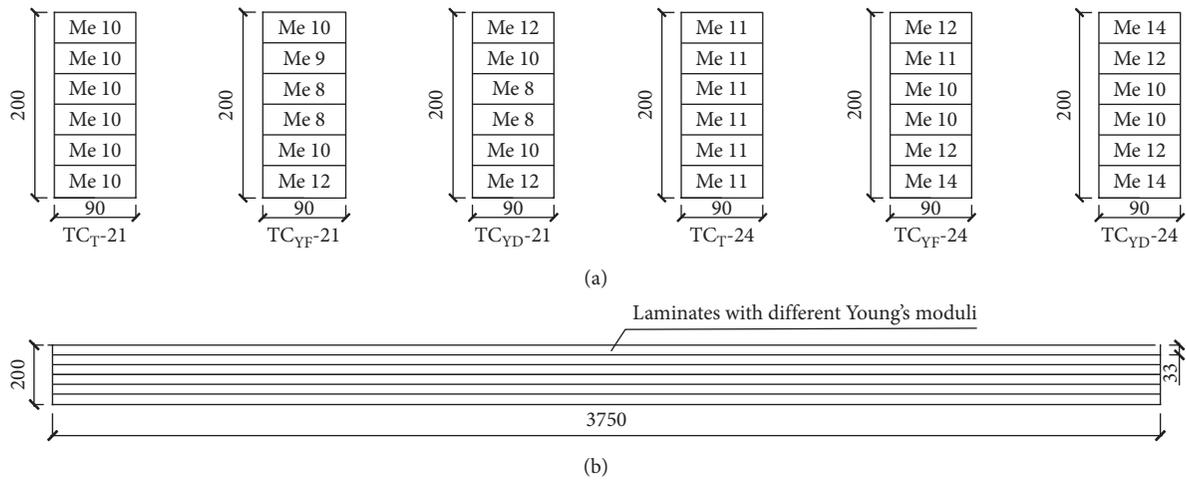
Specimen description. (a) Profiles of specimens. (b) Dimensions of the specimen.
